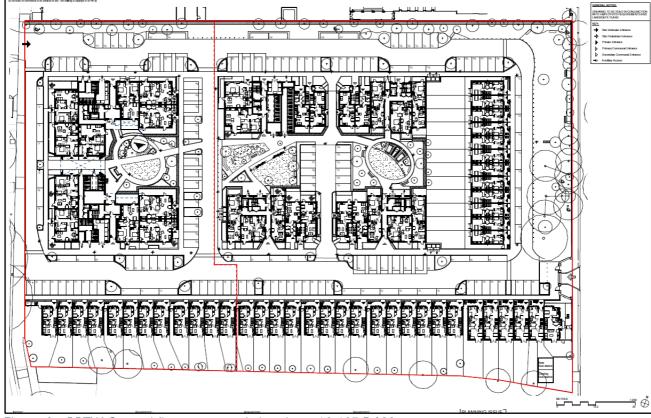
BPTW Ground floor proposed site plan – 18-103 D600
